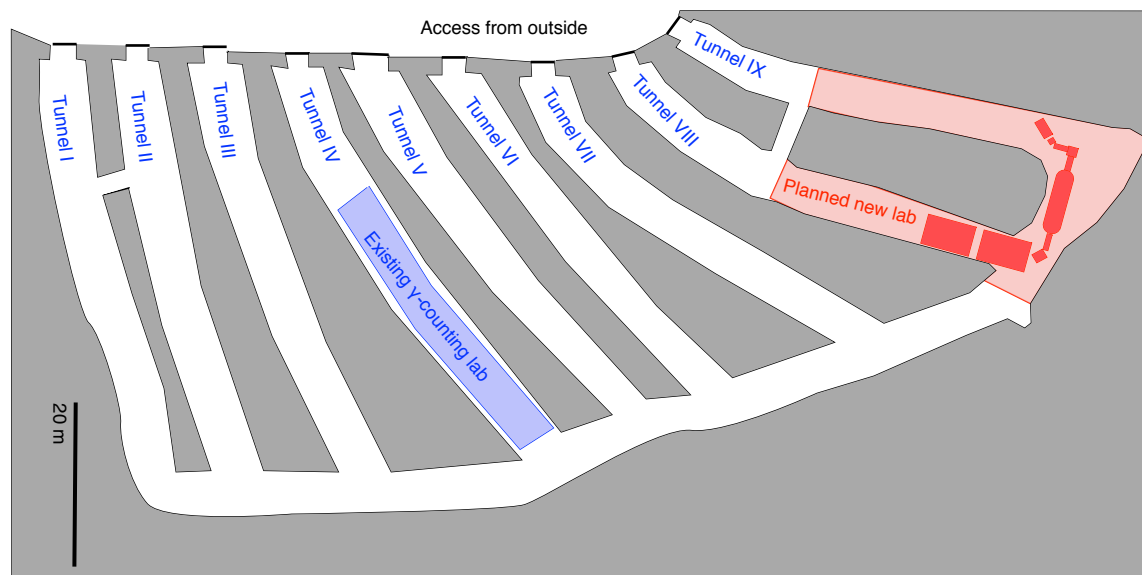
Layout of the Felsenkeller underground facility with the existing [13] and the planned new laboratory.
